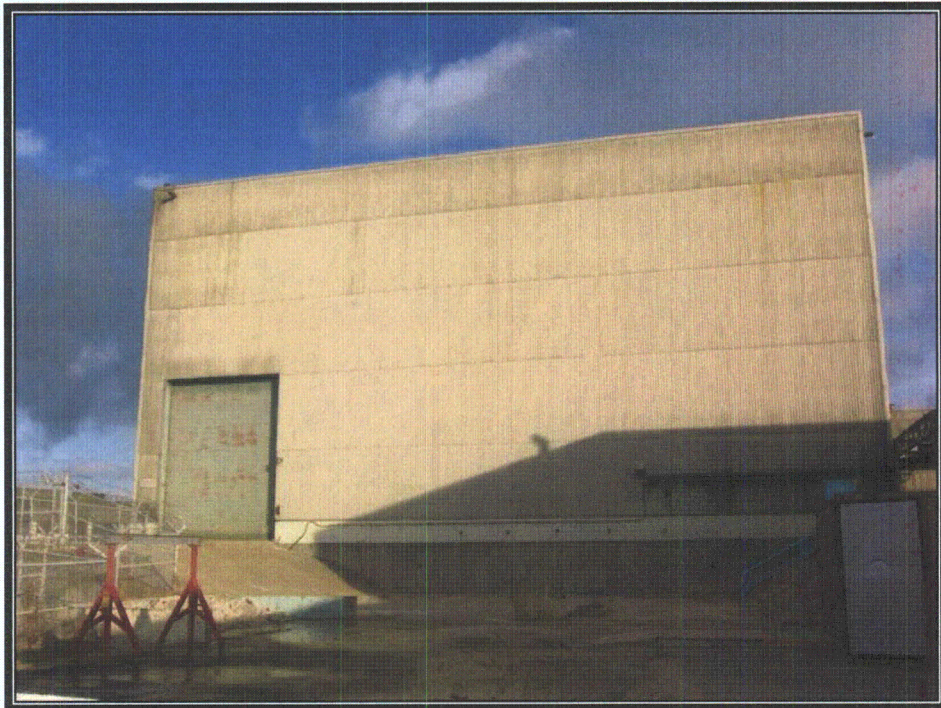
West wall of FARB (Photograph by RCG&A, 2008)
